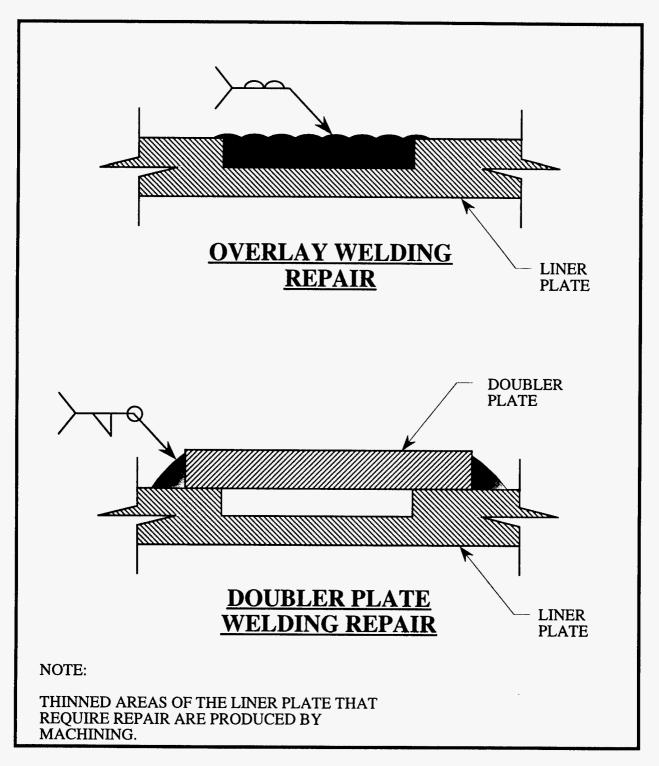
Recommended liner plate repair welding techniques.
